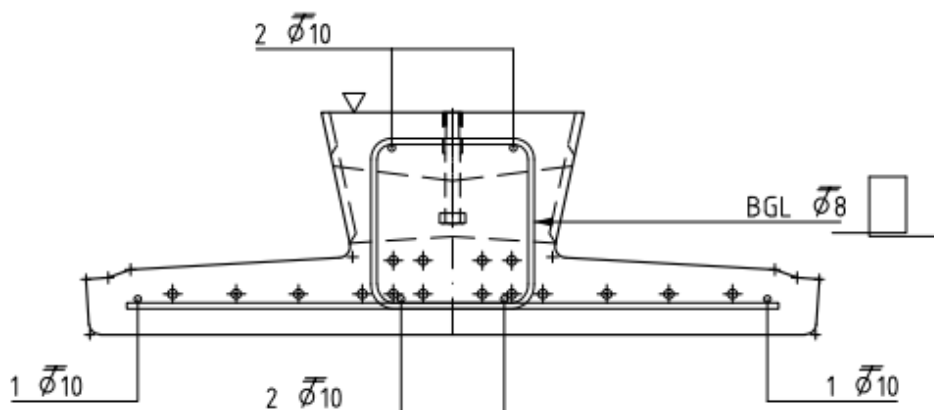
Longitudinal and shear reinforcement of prestressed girder
